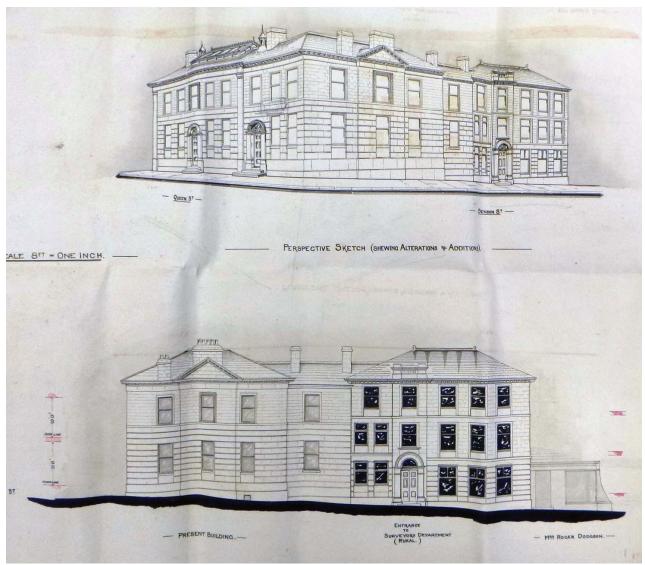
Perspective sketch and elevation to Benson Street of the proposed council offices, dated 1901 (CAC(B) Z/1028/2 1901-1904)
